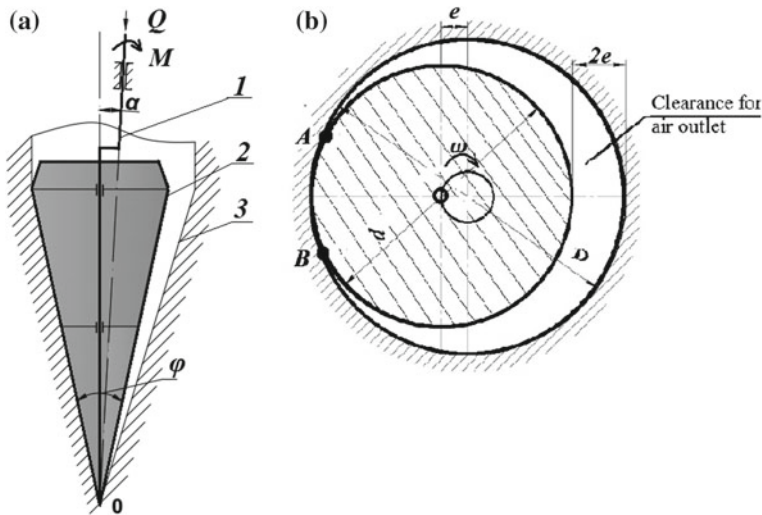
Scheme of the conical rolling of the pit, a side view b top view. 1—Precessing shaft, 2—working body, 3—pit
